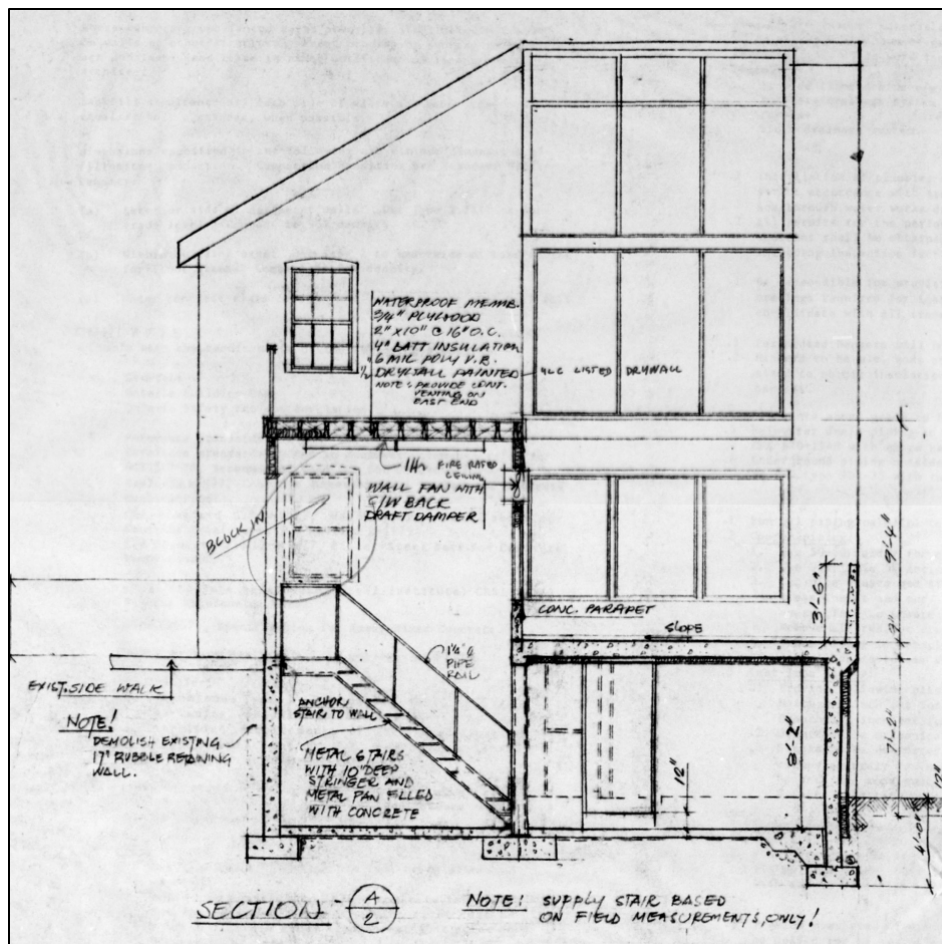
East (rear) elevation drawing by LZA Architects showing two storey rear addition. Toronto Building Records.
